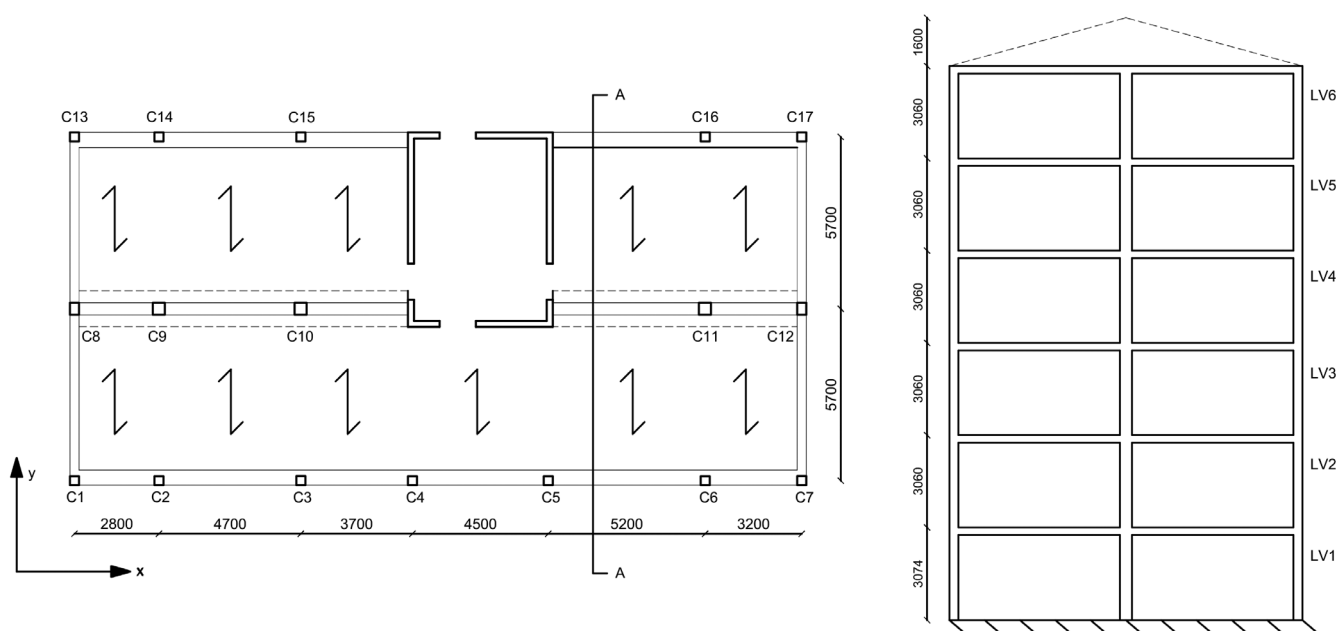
Geometry of the examined building: Typical floorplan and section AA (dimensions in mm)
